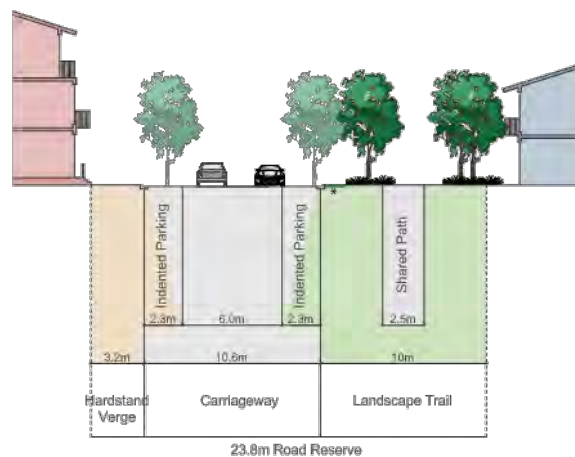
Major Activity Centre - Access Street - Level 2 Sections
